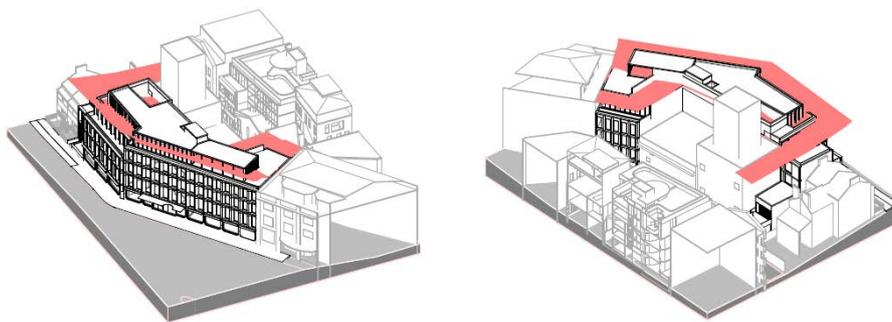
Maximum Building Height – 18 m Height Plan (Source: SJB Associates)
